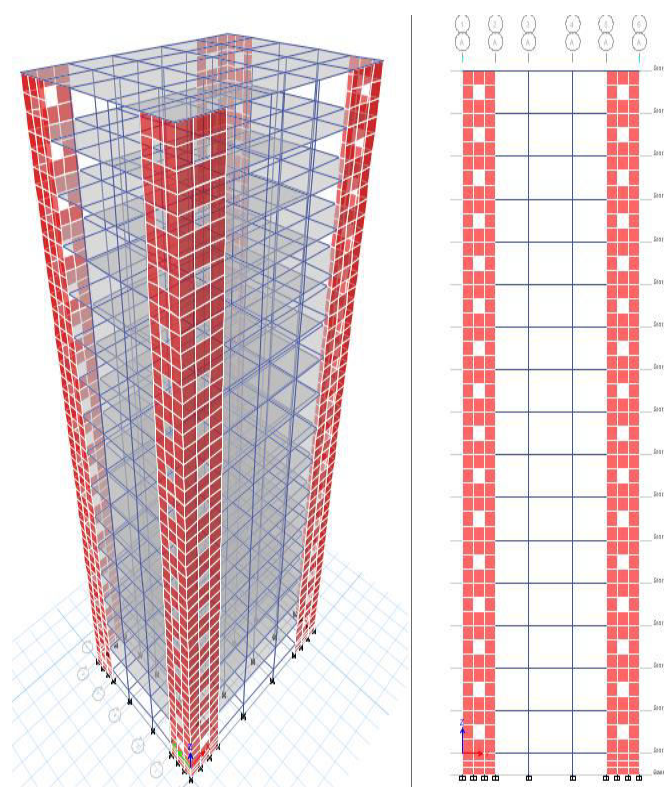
Fifteen storey (G+15) building with shear walls in corners and regular openings
